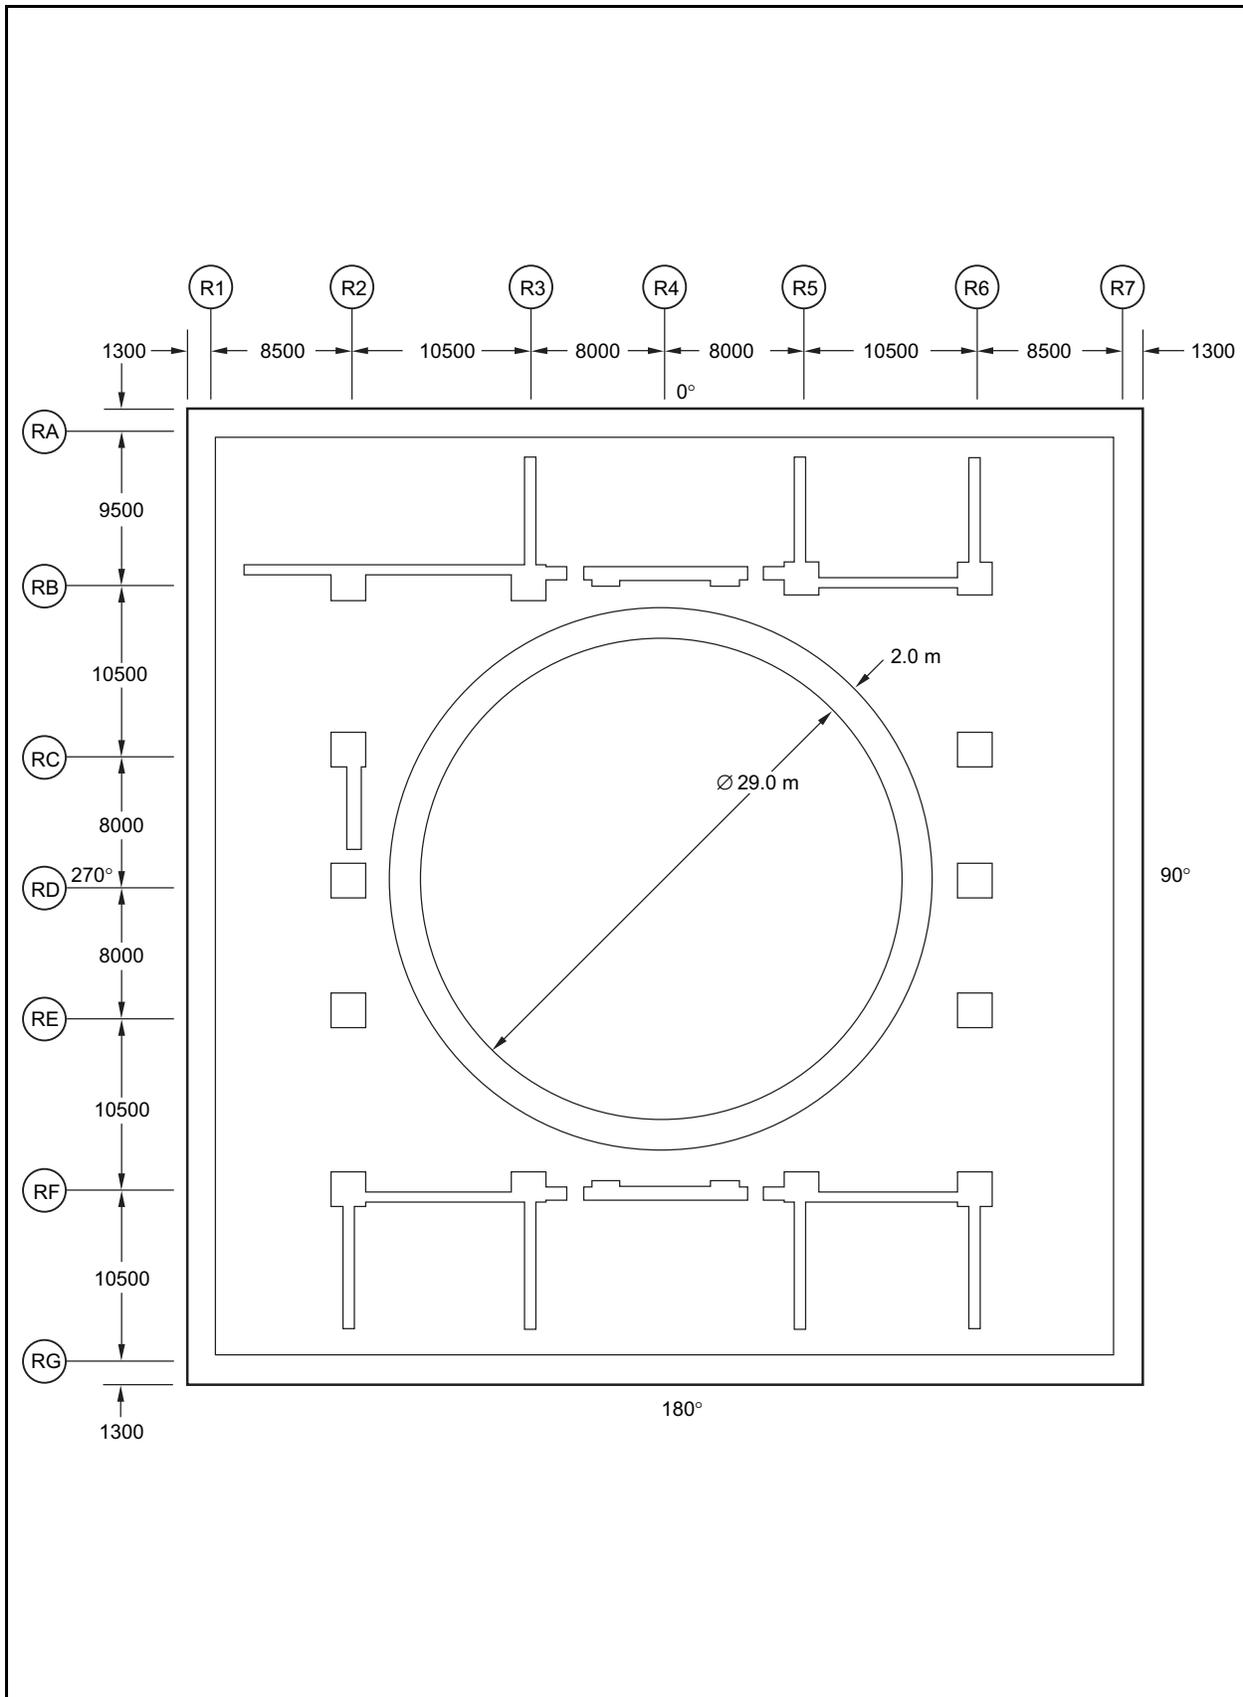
Reactor Building Arrangement Floor B3F Elevation -8200 mm
